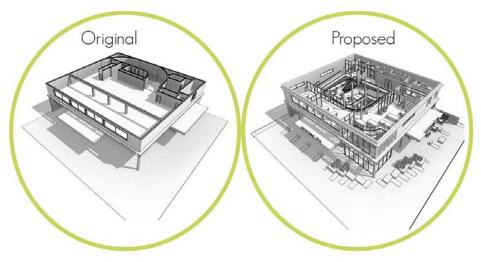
Workspace installation to the Minty's Tyres building
